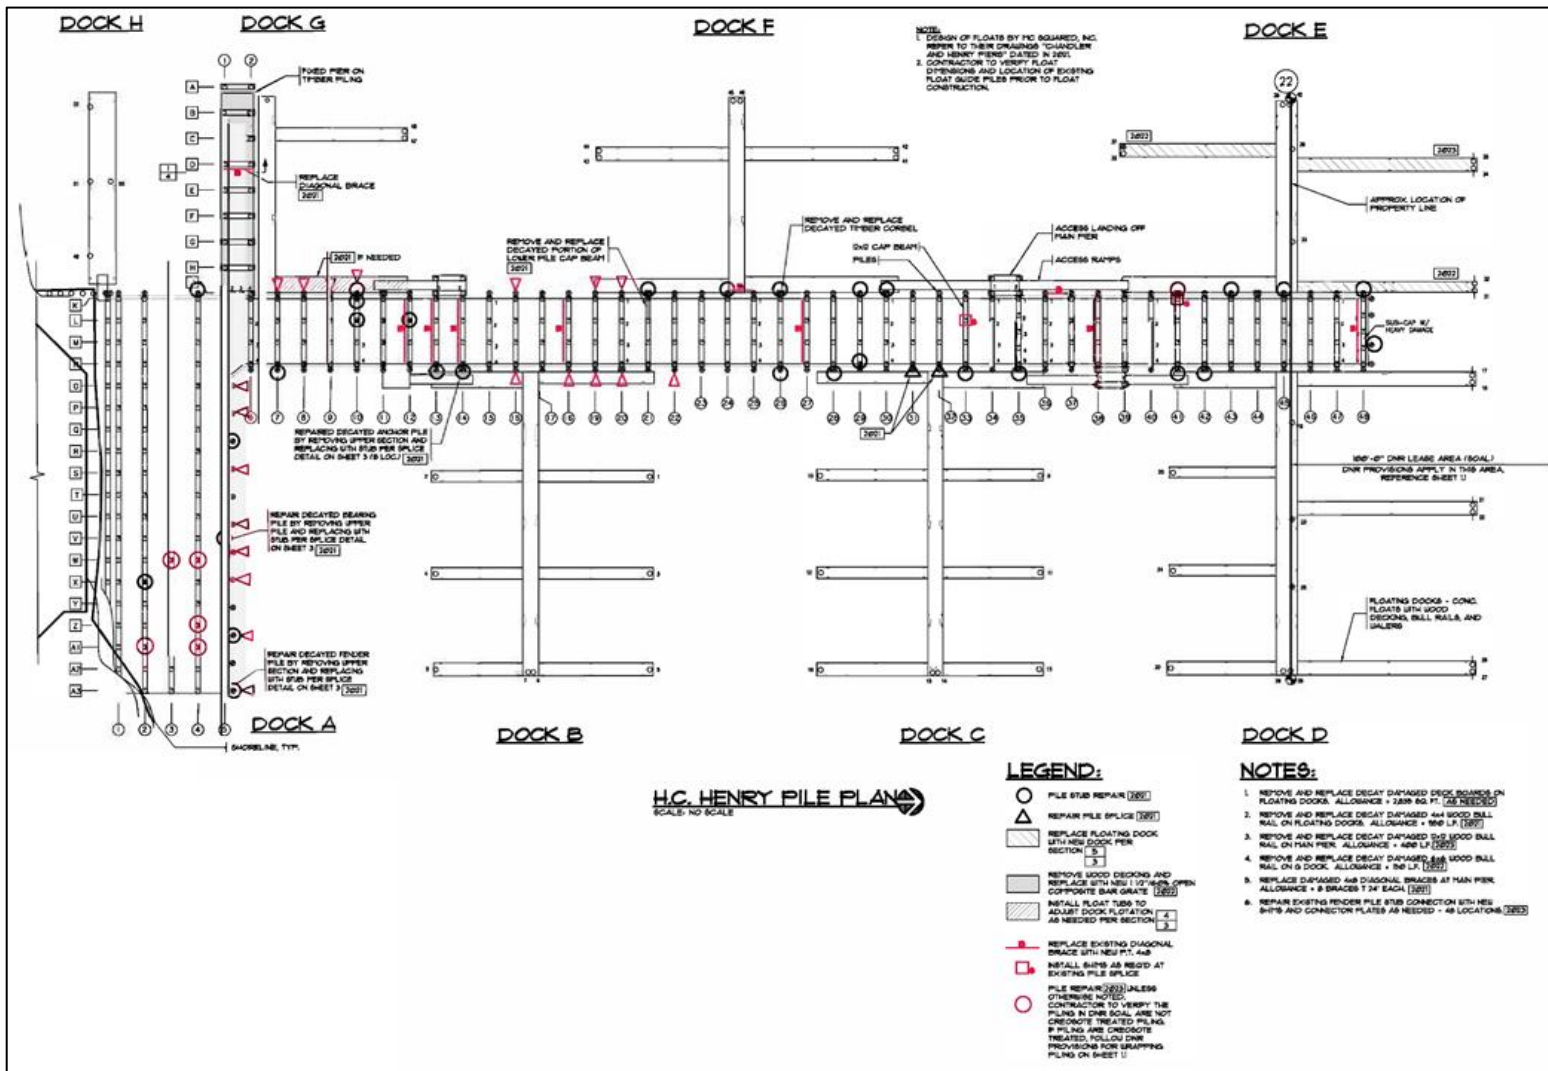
Excerpt from design plans showing proposed repairs to HC Henry Pier (Pacific Engineering Technologies, Inc. 2021b)
